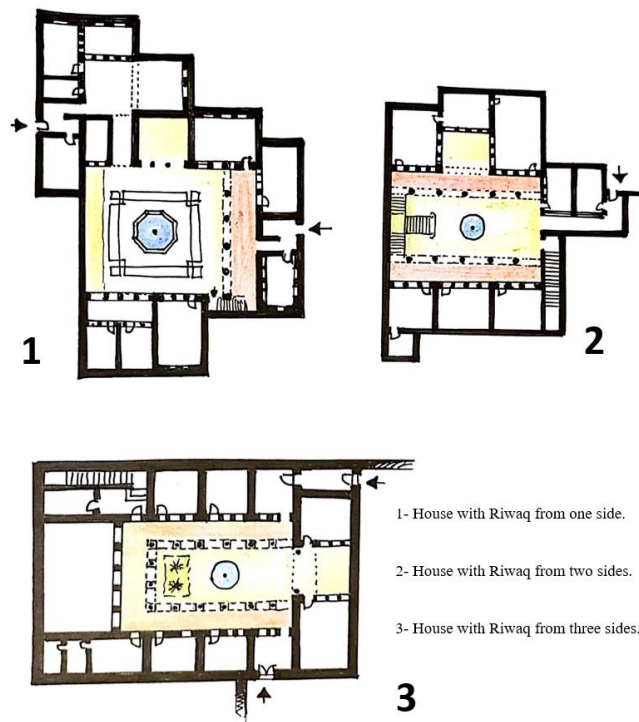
Types of Riwaq in Damascene house sketched by Author.
